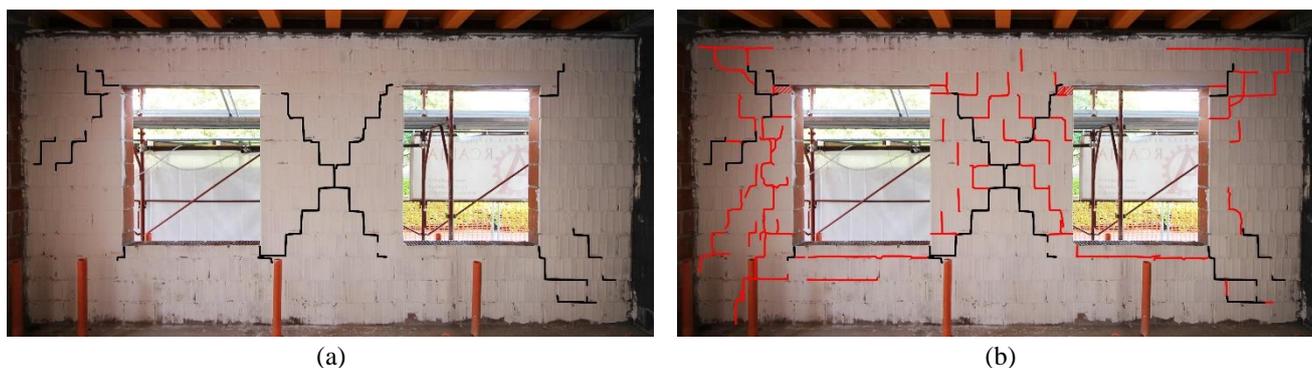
Final crack pattern of East façade at ground floor (inside view); reference (a) and retrofitted (b) building.
